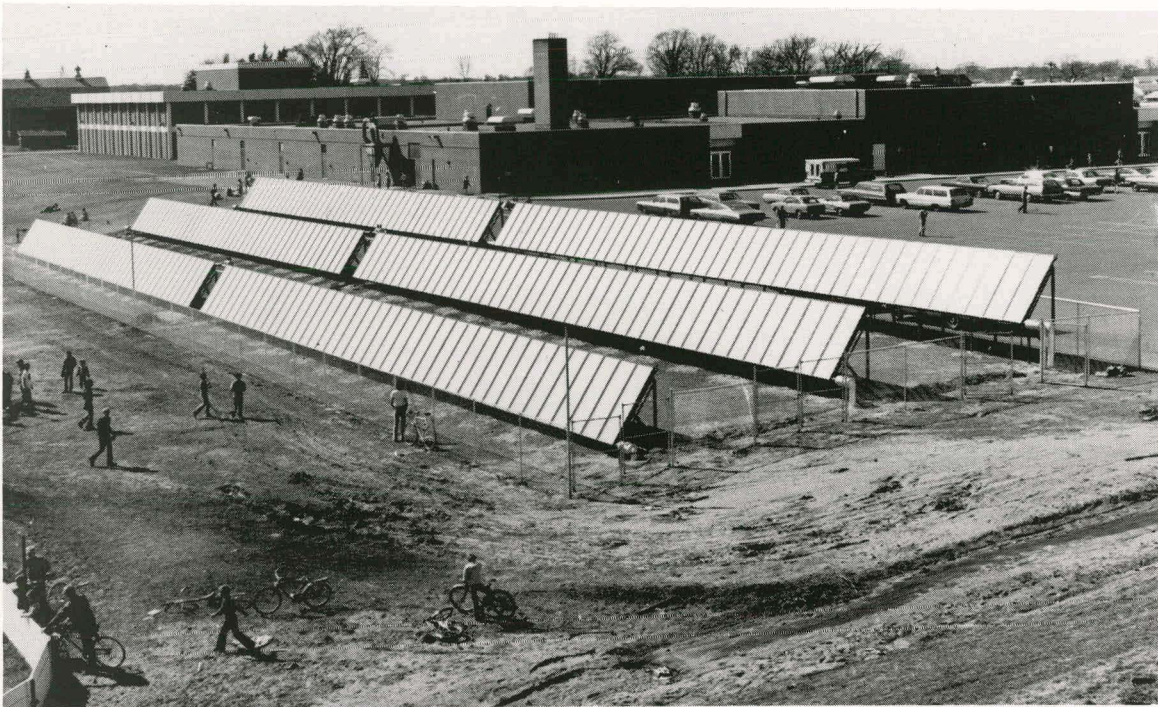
Northview Junior High School Ground Installation of 5000 ft² Collector to Heat Ventilation Air, Domestic Water and Swimming Pool Water
